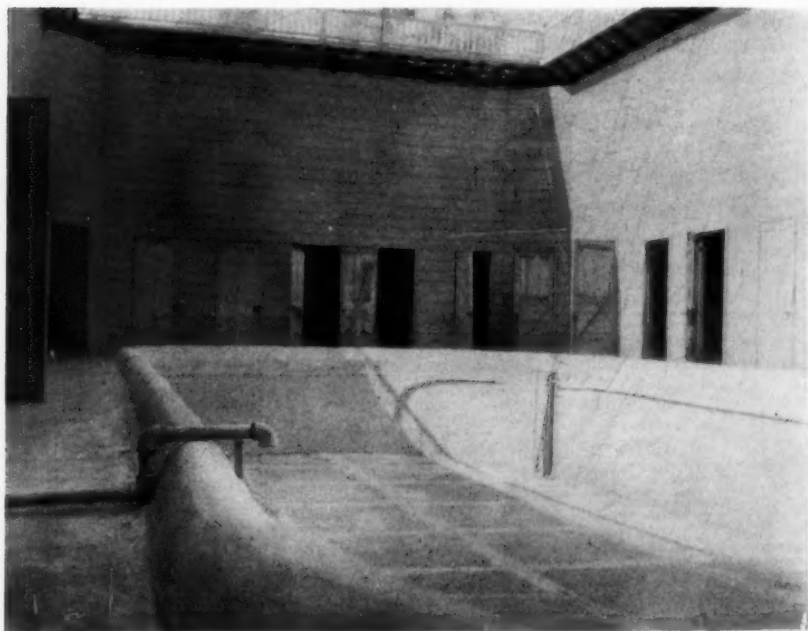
INTERIOR OF BATH HOUSE AND SWIMMING POOL
